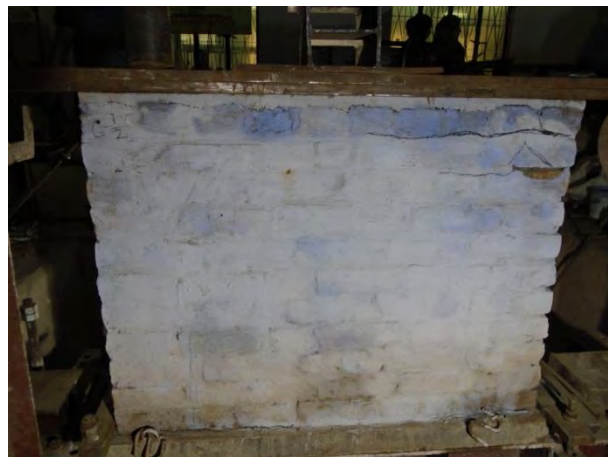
Final Crack Pattern of Specimen Wall C-1/2
